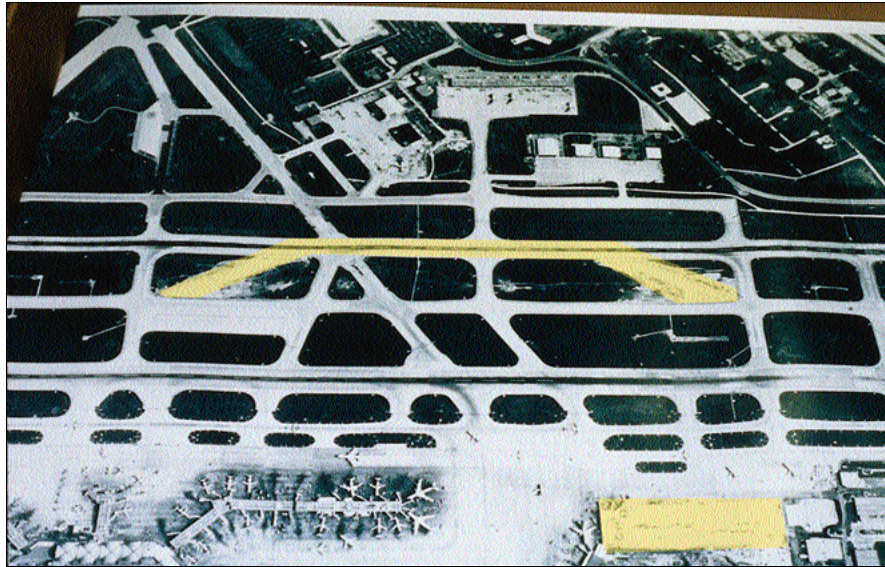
Highlighted areas in this overview of St. Louis-Lambert International Airport show areas where permeable concrete base was recently used.
